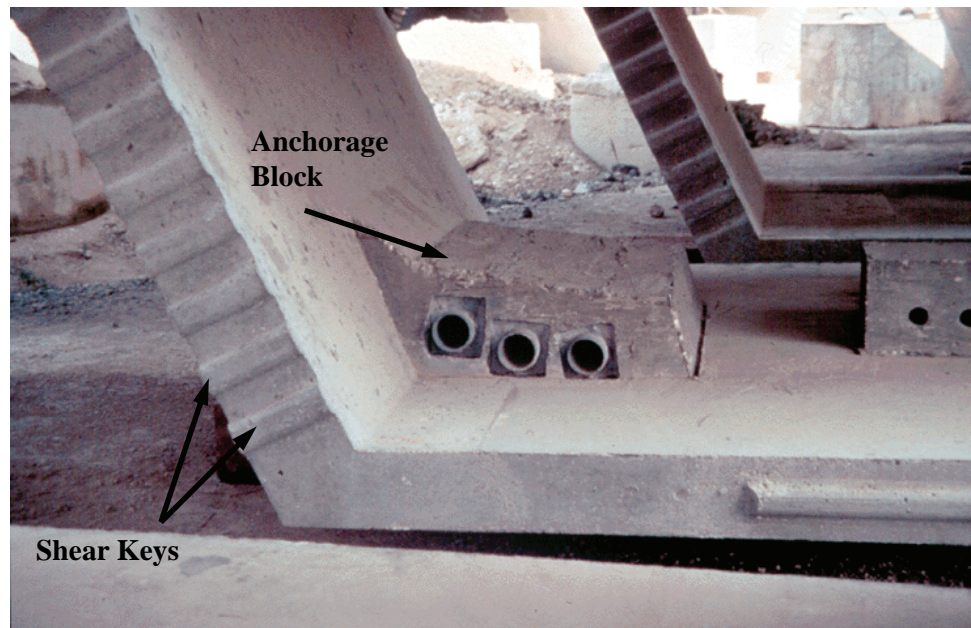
View of Box Girder Joint and Anchorage Block
